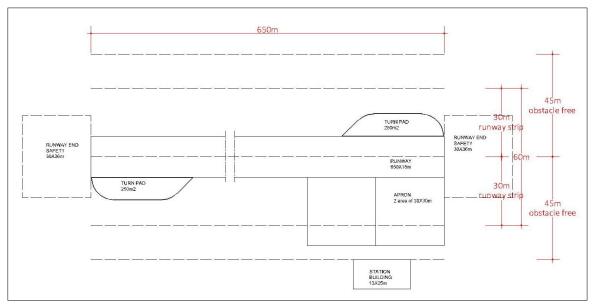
Layout of a Prio. A airstrip. Source: Own elaboration.
